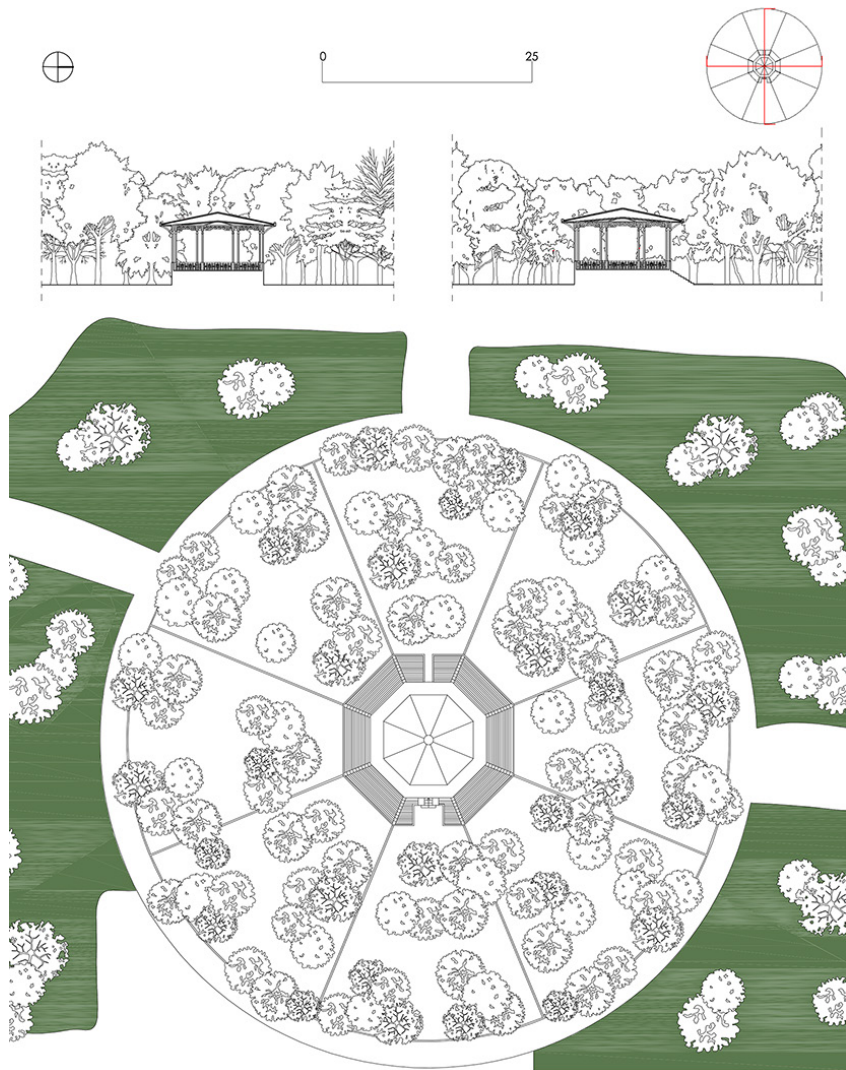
The Retiro Park in Madrid, *Templete del Retiro*, roofs plan, section A-A' (left), section B-B' (right).
